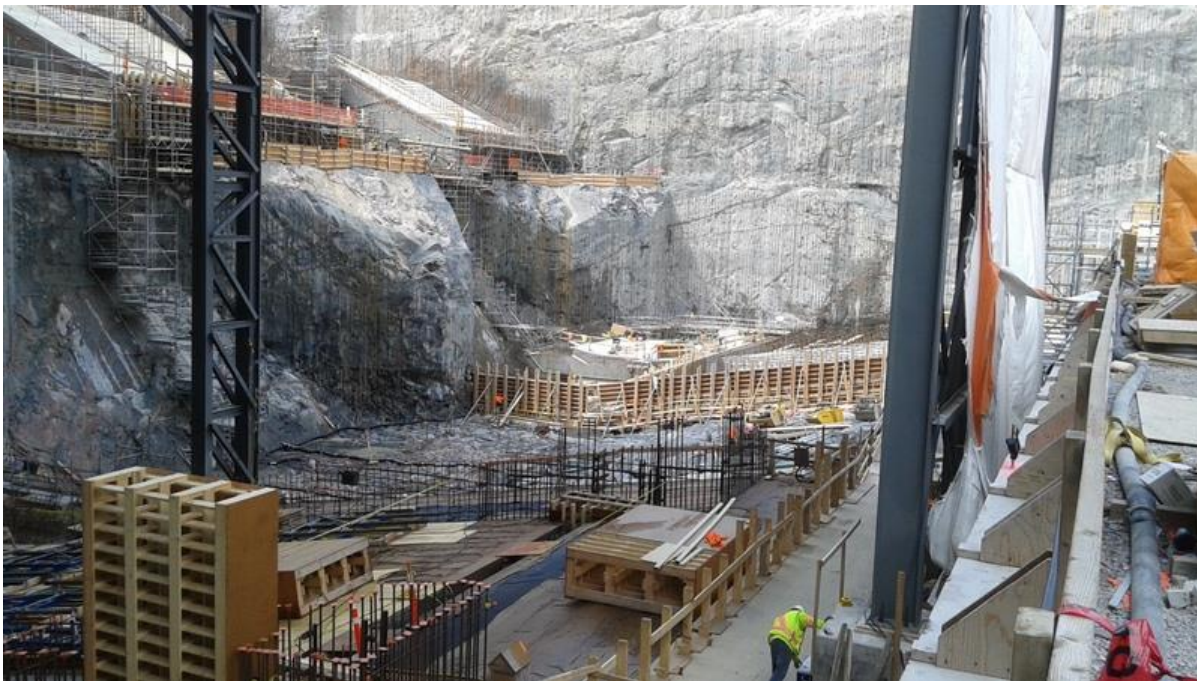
Units 3 and 4 – Downstream concrete blocks of the Intakes invert slabs completed. Formwork and reinforcement partially installed for draft tubes invert slab concreting (July 7, 2015).
